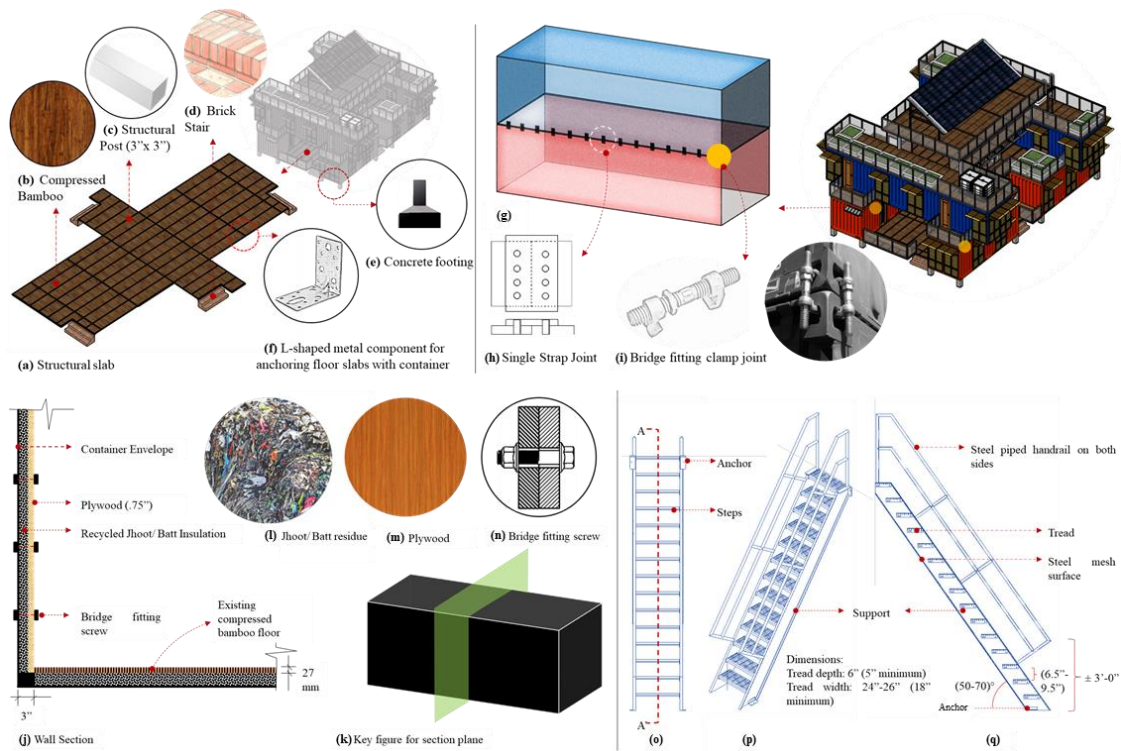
(a) Structural slab; (b) Compressed Bamboo; (c) Structural post; (d) Brick Stair; (e) Concrete footing; (g) Vertical joint of similar faced containers; (h) Single Strap Joint; (i) Bridge fitting clamp joint. Insulation strategy frameworks: (j) Wall section; (k) Key figure; (l) Jhoot/ Batt residue; (m) Plywood; (n) Bridge fitting screw. Ship Ladder Go structural details: (o) Plan of stair, (p) Axonometric visualization, (q) Longitudinal section.
